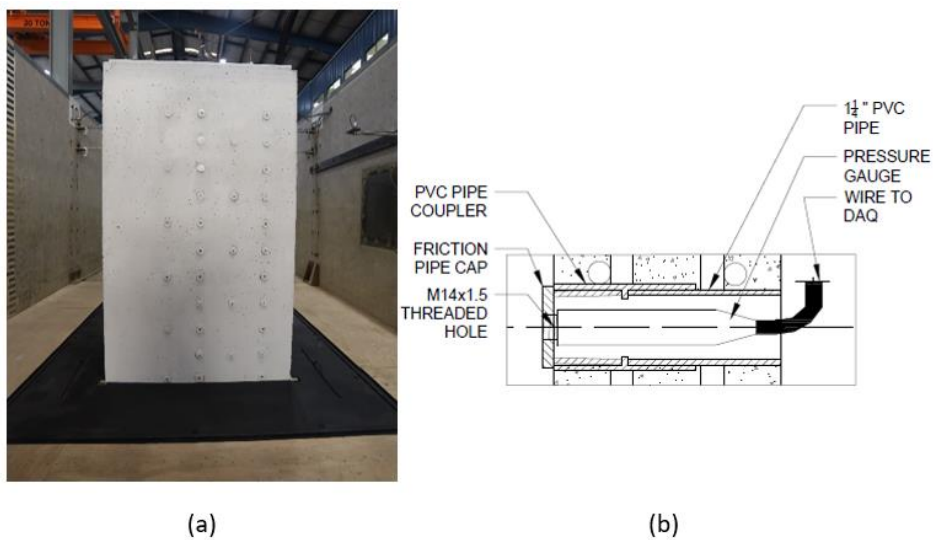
(a) Installed Pressure Sensors and (b) Pressure Sensor Install Schematic
